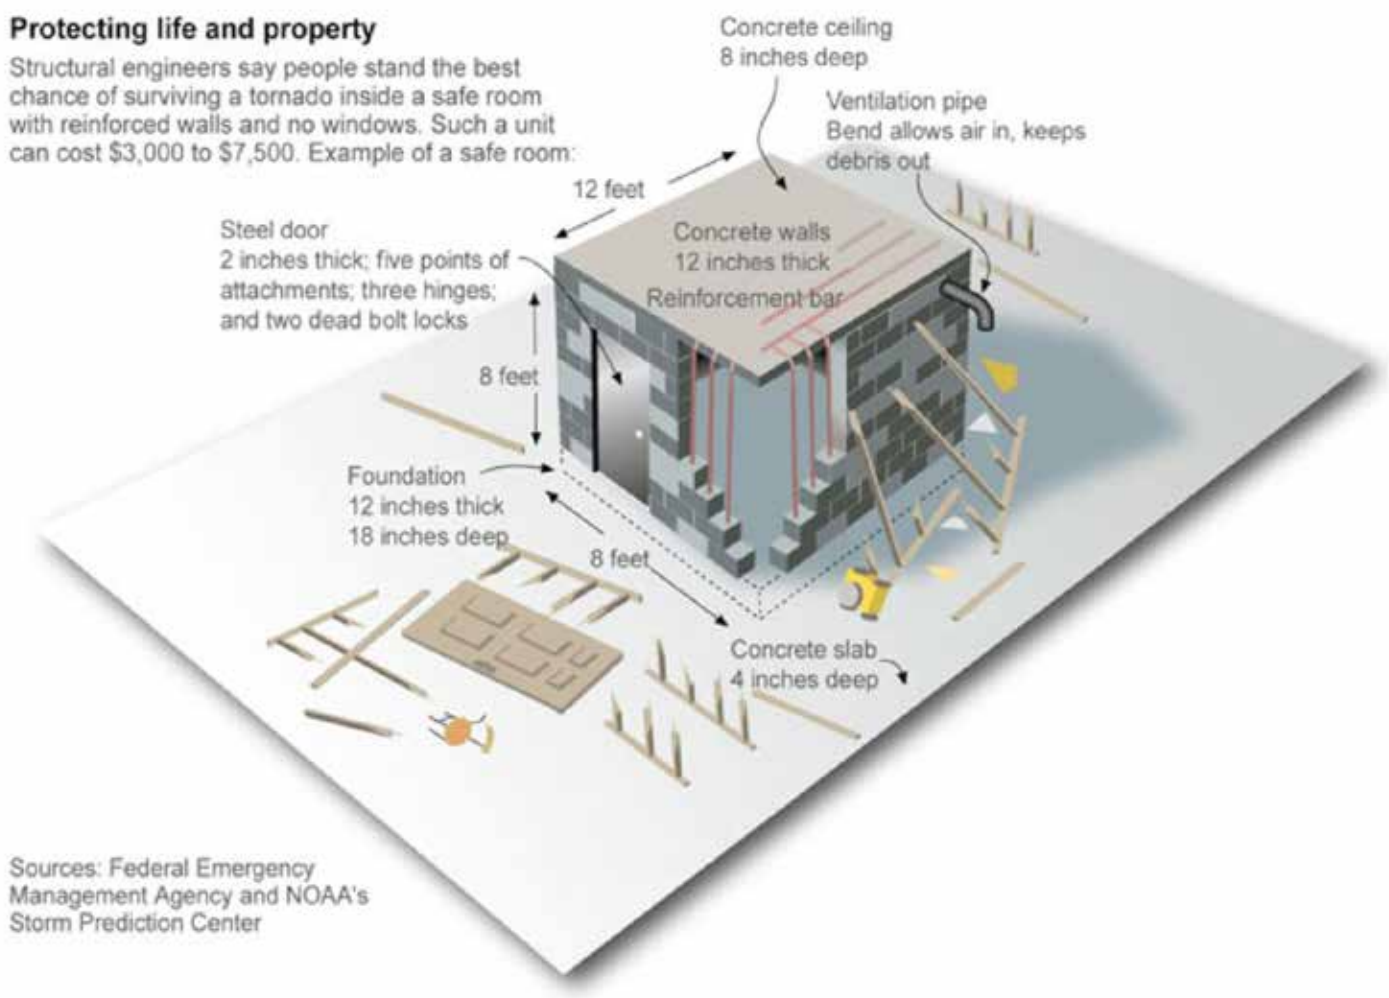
There are several designs for storm shelters that are designed to withstand tornadic winds. Some of these can be built when the home is constructed, whereas others can be retrofitted (Source/Credit: FEMA and NOAA).
